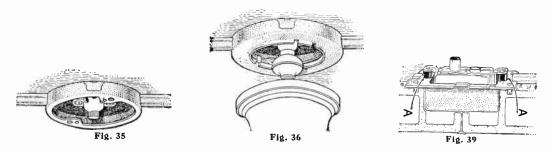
illustrates the No. 538 Box installed complete with fixture stud ready to hang fixture. Fig. 36 illustrates the method of assembling round canopy rings Nos. 541 and 542 with the No. 538 Box, which is done by simply bending back the four small ears of these rings to engage over the flange of the No. 538 Box.
